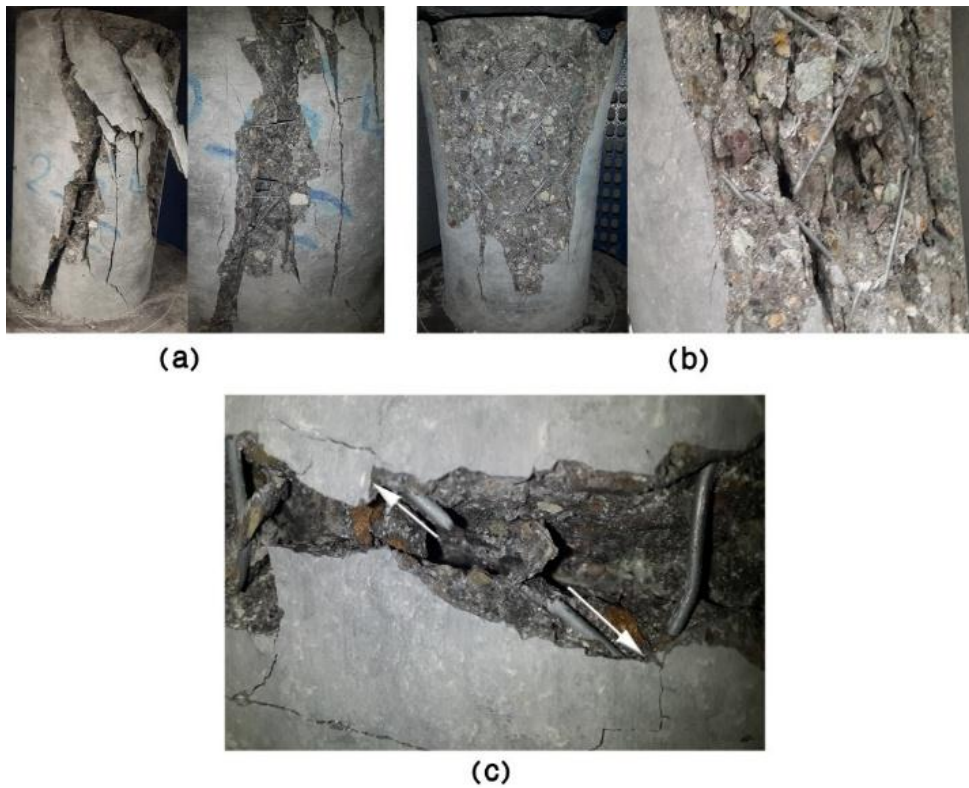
(a) HWM were deformed and wires were yielded at final loading stage for CG4 specimen (b) Inside CG5 specimen after removing concrete cover (c) Tensile failure mode of wires in CG5 specimen.
